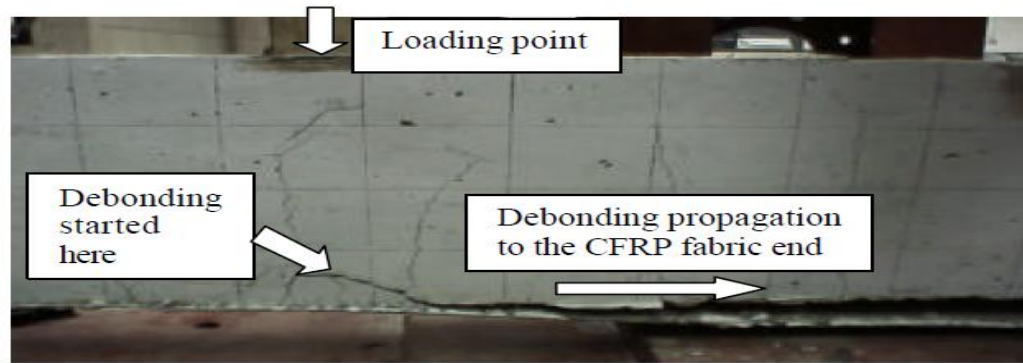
Debonding Failure between FRP Fabric and Concrete
